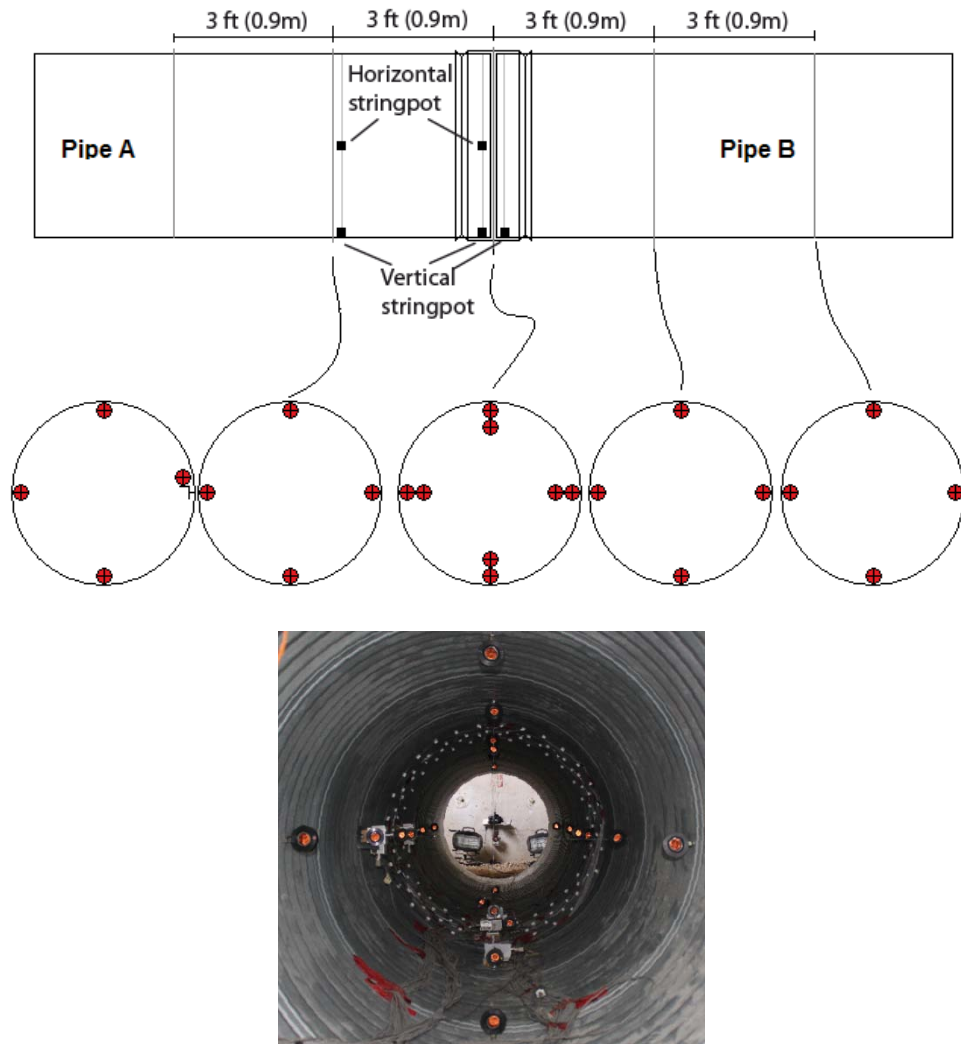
Reflective prism and string potentiometer scheme for the 36 in. (915mm) diameter corrugated steel pipe with O-rings.
